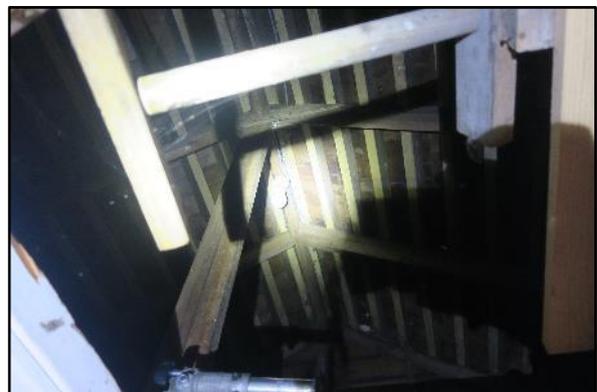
Showing typical view of the loft void above the detached garage at Cedar House.
